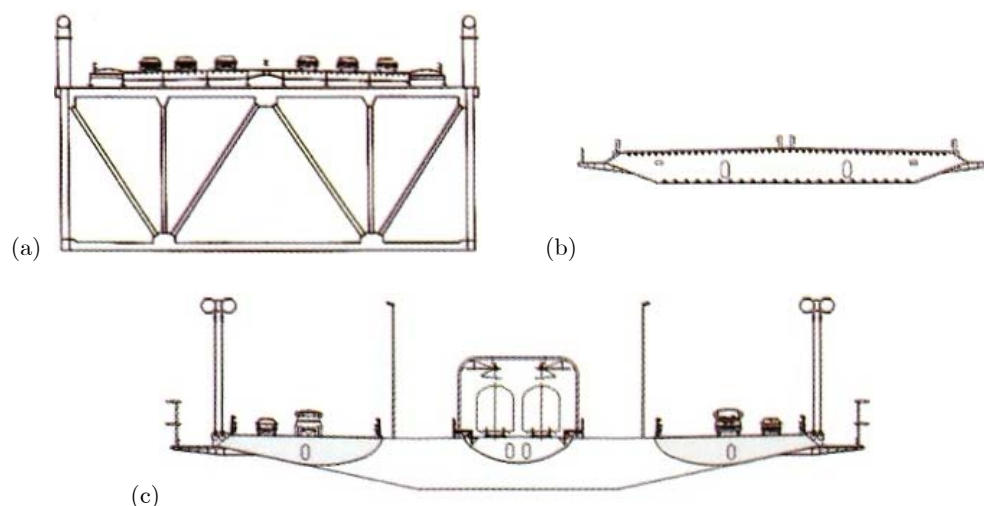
Truss girder of the Akashi-Kaikyo bridge (a); single box girder of the Jaingyin Bridge (b); multi box girder of the Messina Bridge design
